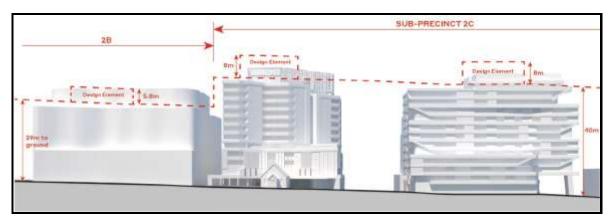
Developments approved at 682-684 Doncaster Road (left), proposed Planning Permit Application (PLN20/0303), and 666 Doncaster Road (right)
